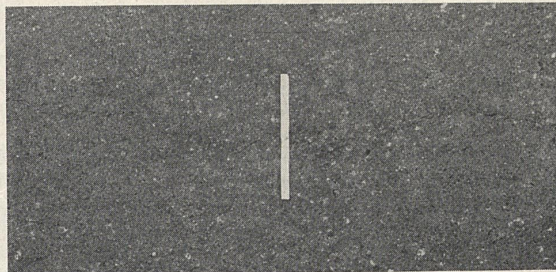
TYPICAL FINE CRACK IN A HEAVILY REINFORCED SLAB CONSTRUCTED IN THE ARLINGTON CURING TESTS, 13 YEARS AFTER CONSTRUCTION.
